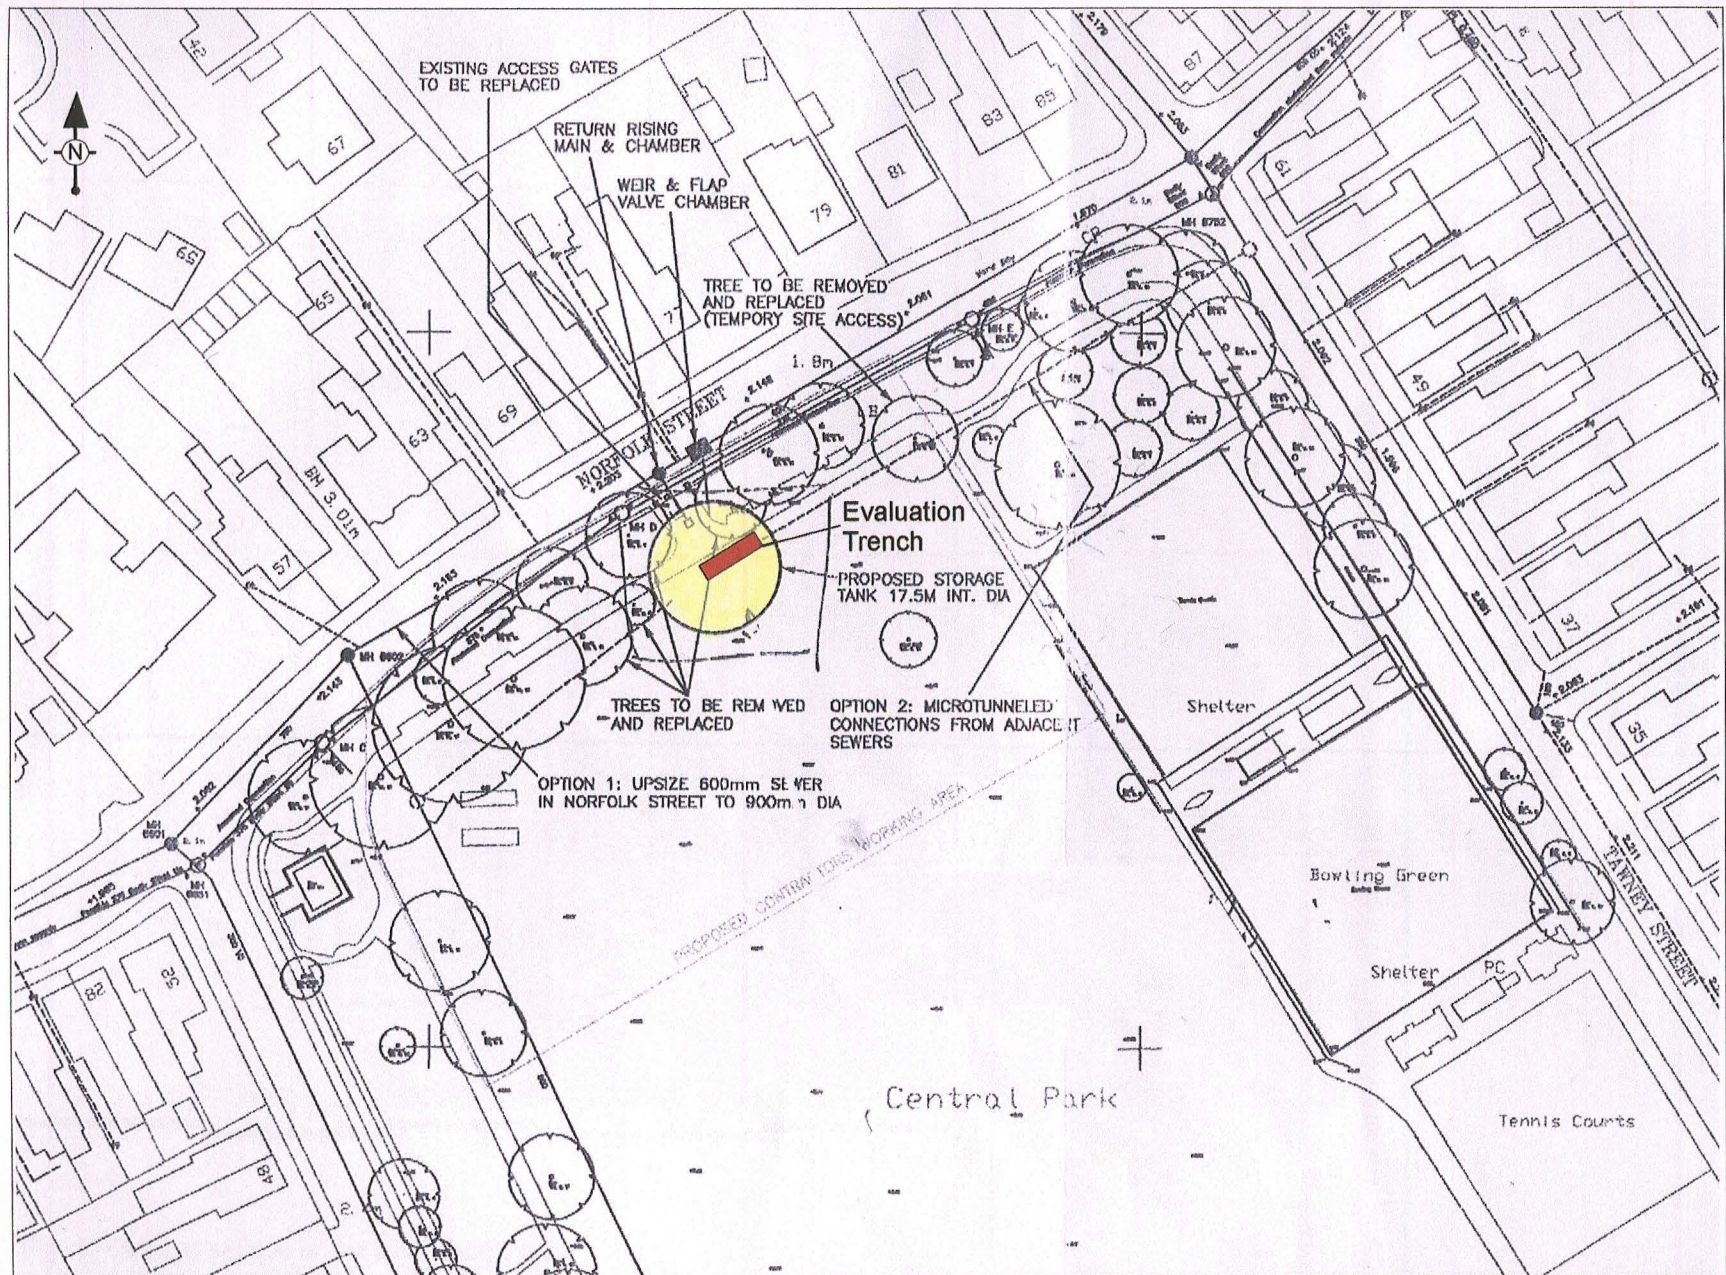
Plan showing Central Park with the proposed development site and evaluation trench superimposed (from a plan supplied by the client)
